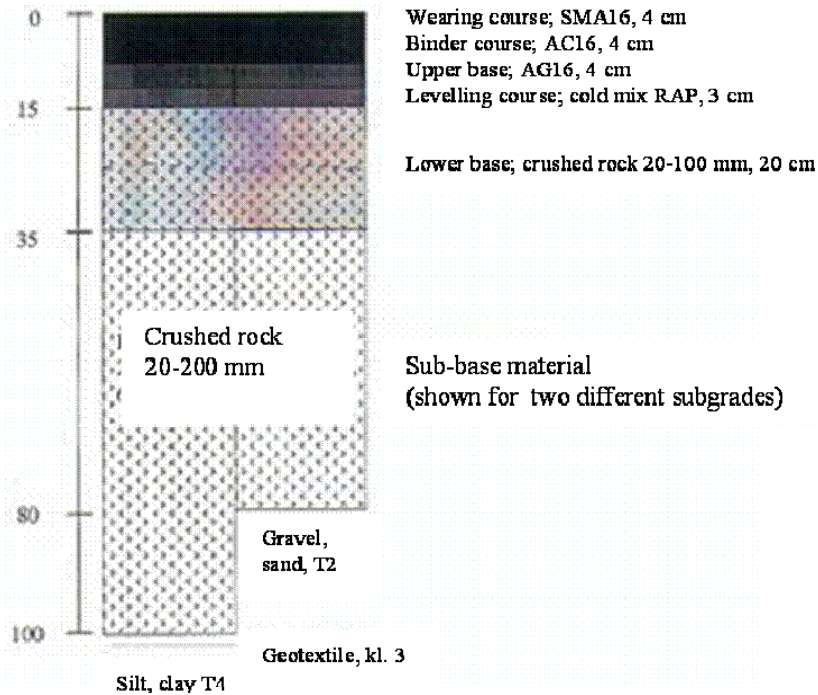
Pavement construction at E6 Melhus, layer details (shown for two different subgrades)
